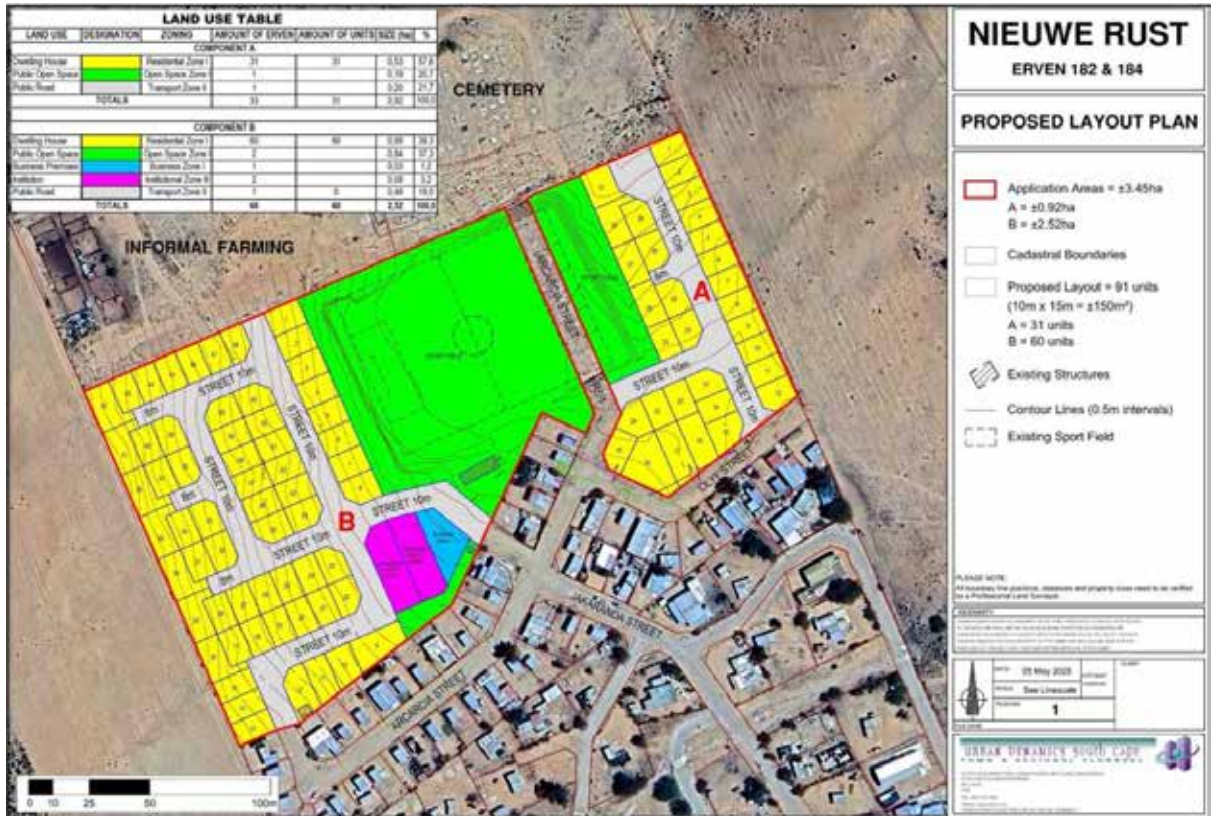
Proposed Layout Plan – Erven 182 and 184, Nieuwe Rust
